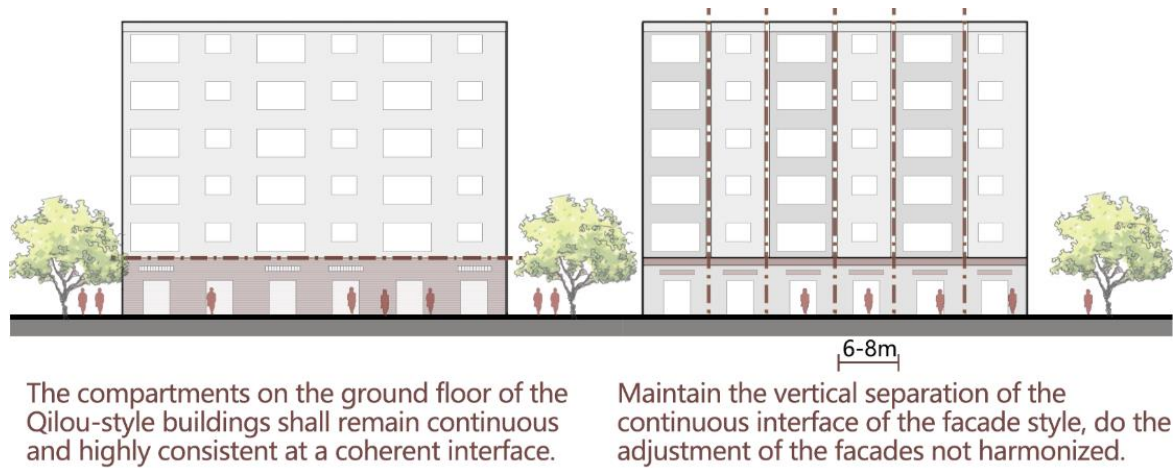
Detailed intervention for T3#1 (Source: the author)
